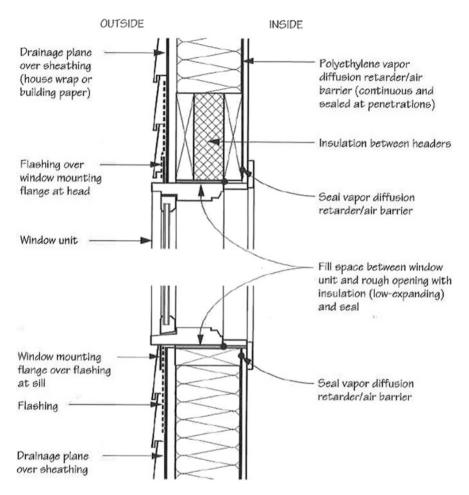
Example of window installed as part of drainage wall system. (Illustration taken from *Residential Windows: a Guide to New Technologies and Energy Performance*)
